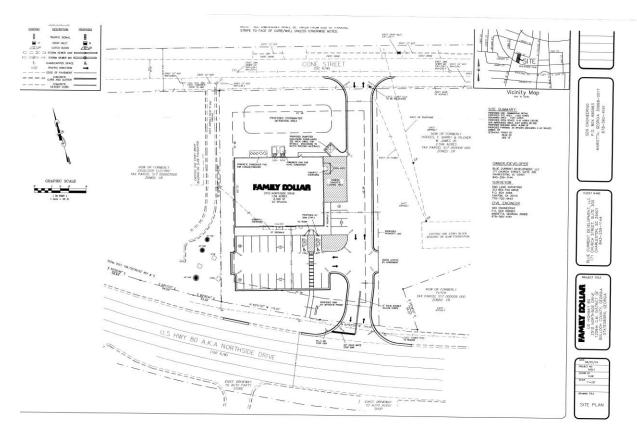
EXHIBIT C: FAMILY DOLLAR SITE PLAN
